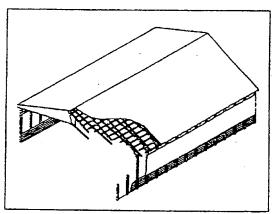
An ideal dry stack storage facility is a roofed structure with an earthen or concrete floor.
